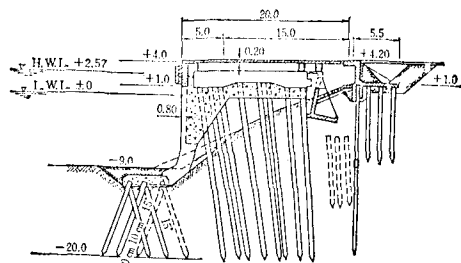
Cross Section of Repaired Quaywall in Yokkaichi Port
